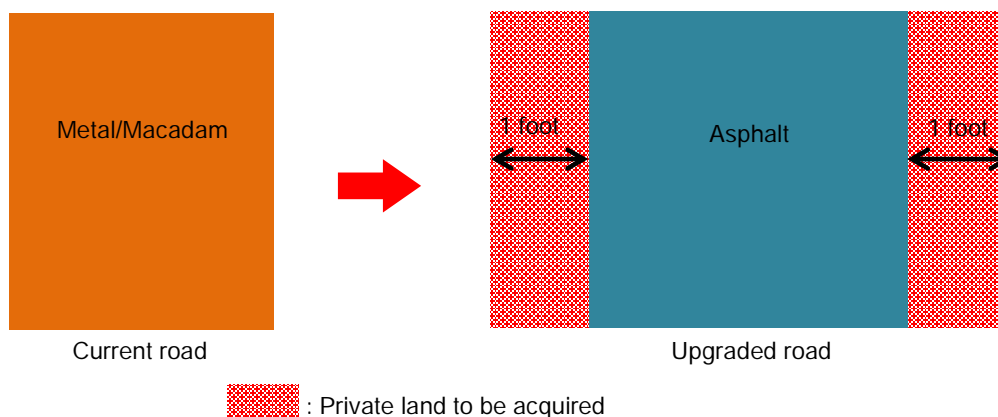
Land to be Acquired by the Road Up-grading
